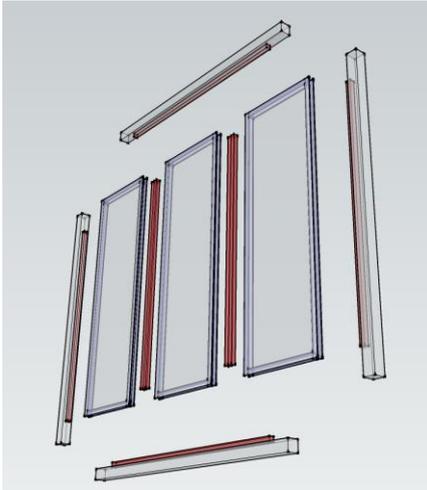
Construction process: exploded wall showing Beam/column-to-panel connection and panel-to-panel connections
